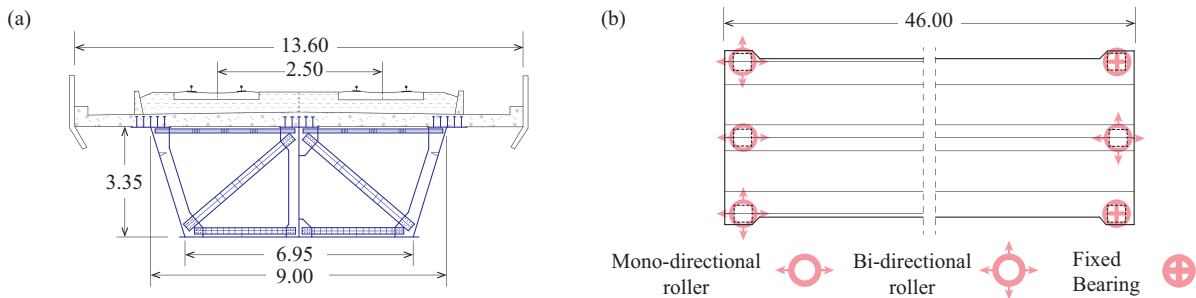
Cross-section of the box girder (a) and bearings layout (b) of the Sesia viaduct (units in m).
